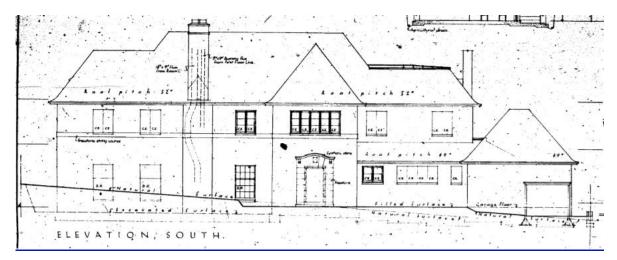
The principal elevation facing Yarrbat Avenue, from the original house plans. (Source: City of Camberwell Building Permit 9410, dated 8 March 1938)
